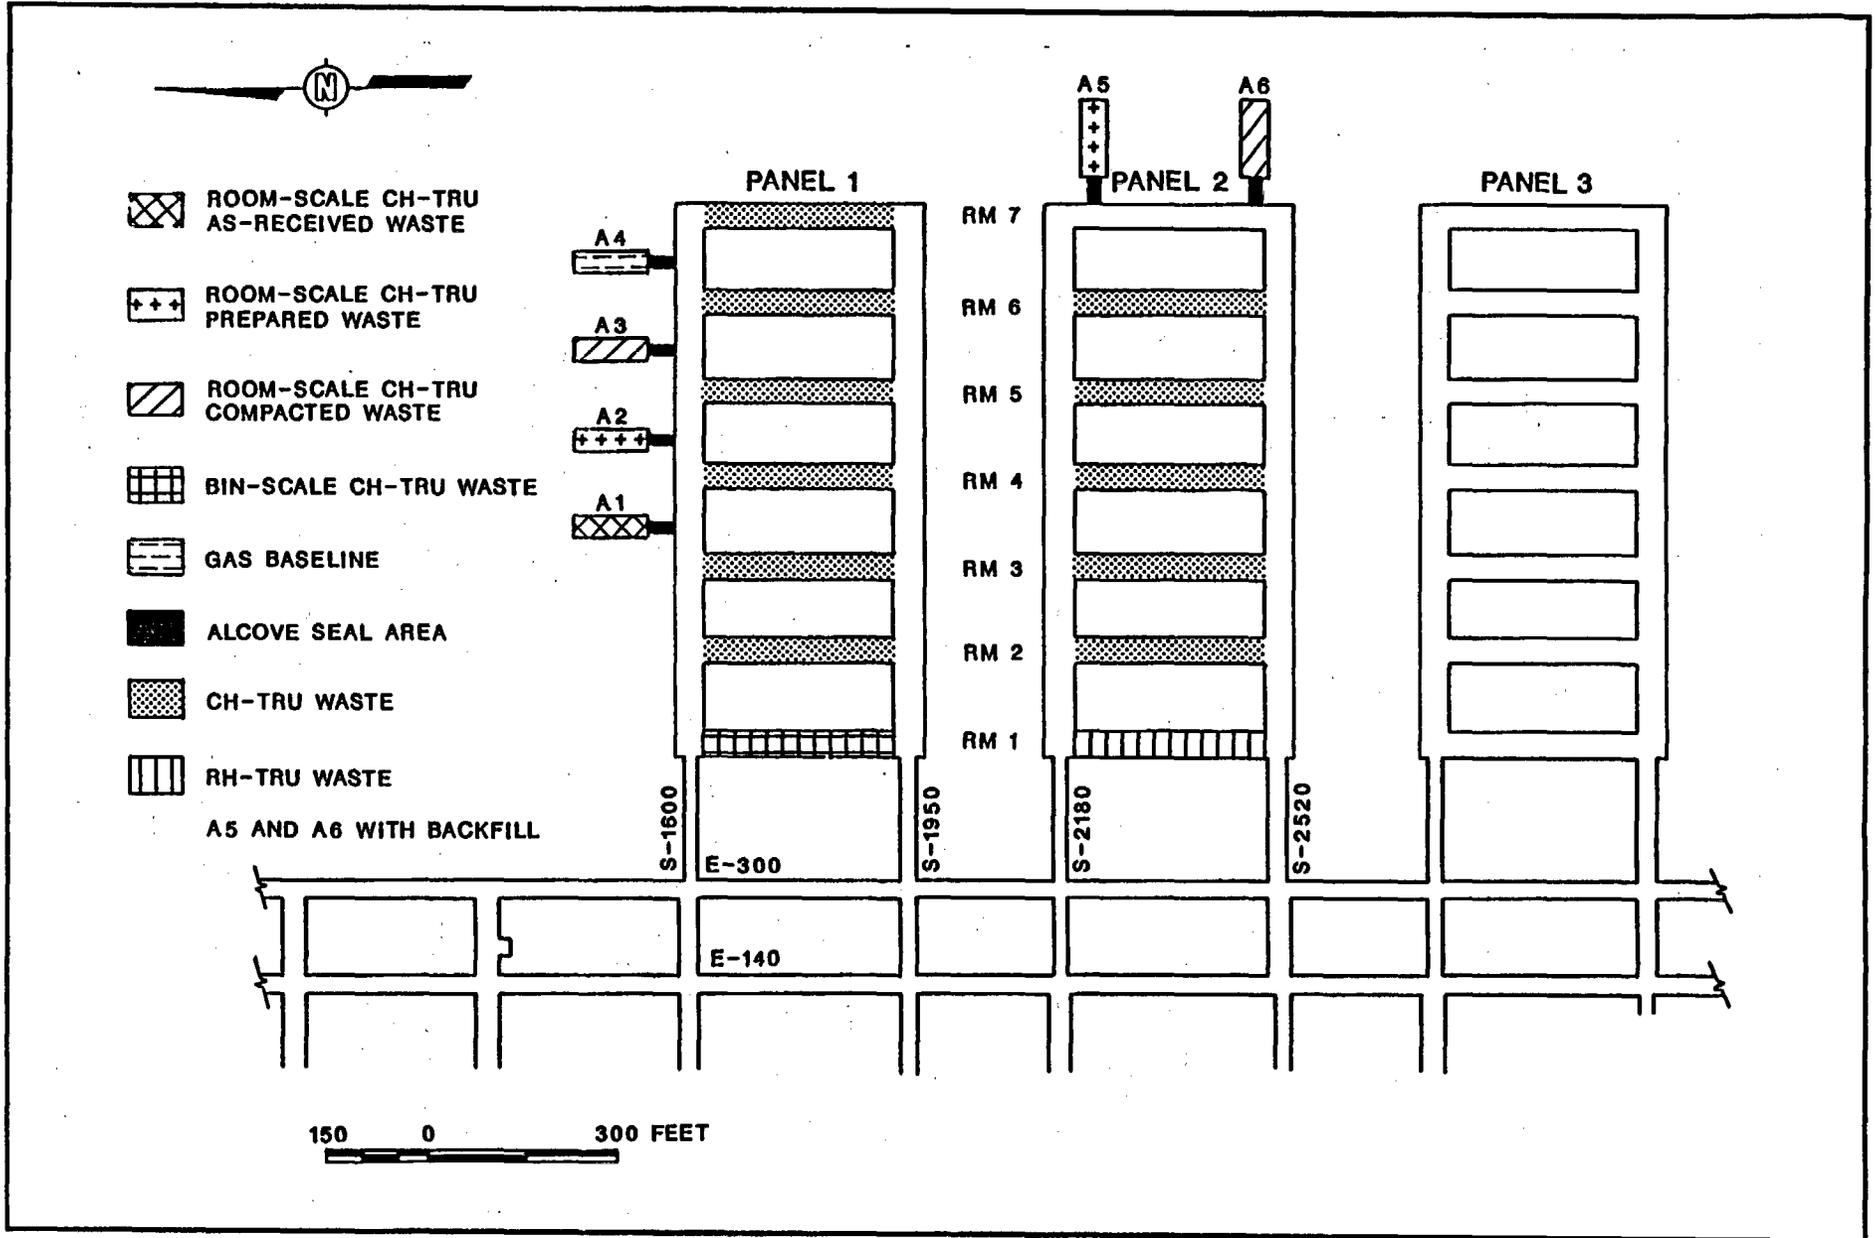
TRU Waste Test/Disposal Area (Panels 1 and 2)
